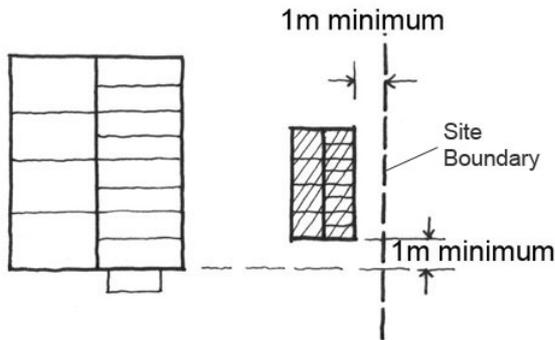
Detached outbuildings should be set back at least 1m from the front main building line of the main house and at least 1m from the site boundary.
